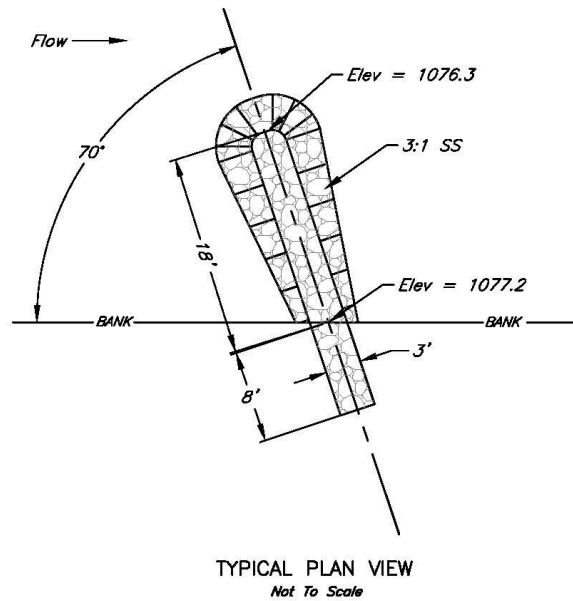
Sample plan view of barb with key into bank; dimensions and angles will vary based on actual site design.
